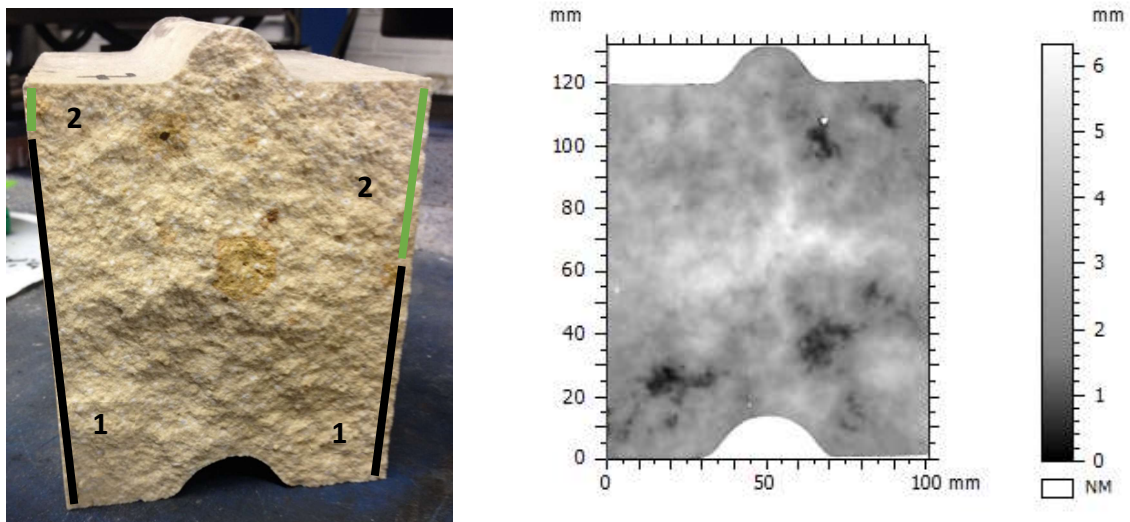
Fracture surface of XL1 ZY1.
